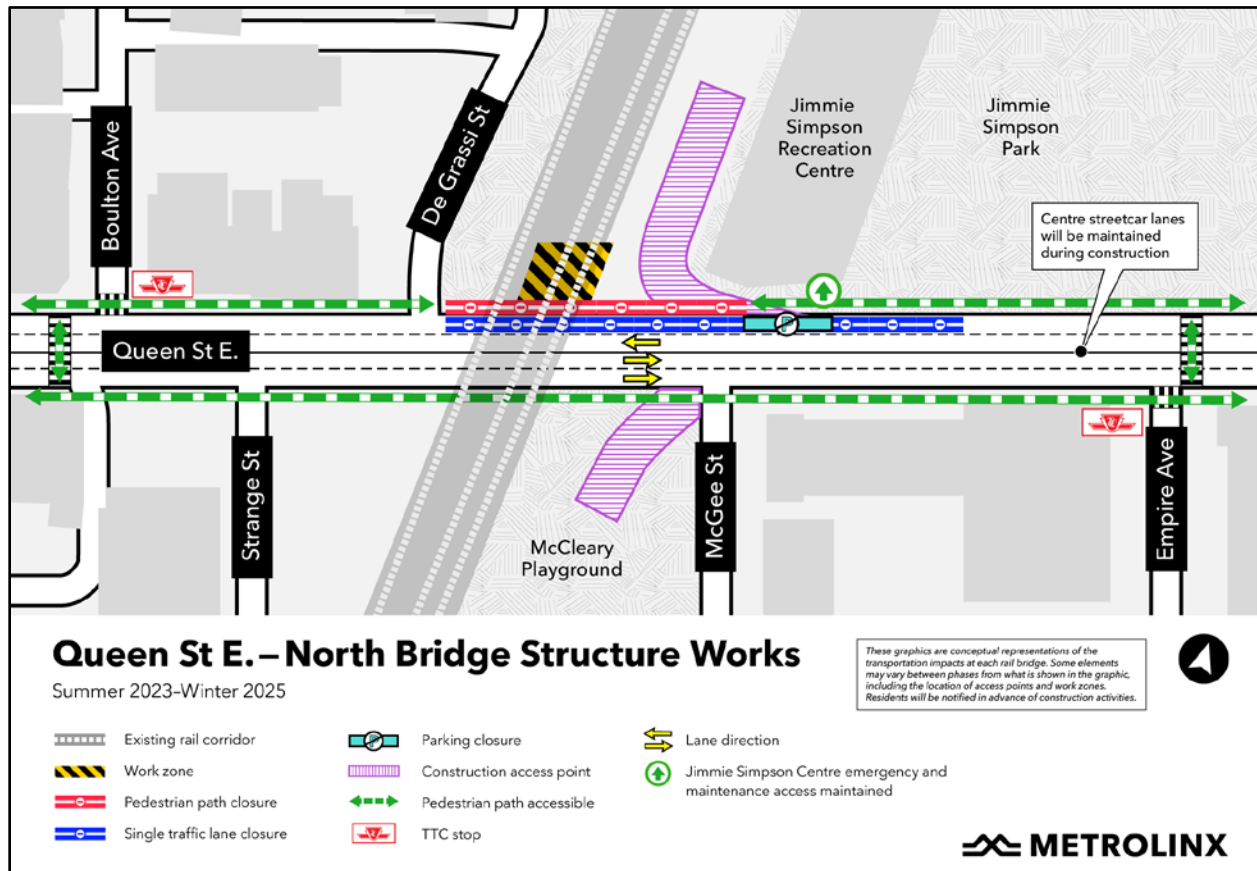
Queen Street Traffic Management during North Side Bridge Structure Works Source: Metrolinx
